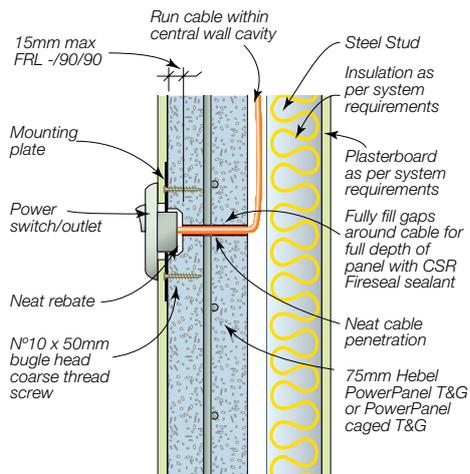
Power switch / outlet installation to steel stud or furring channel
